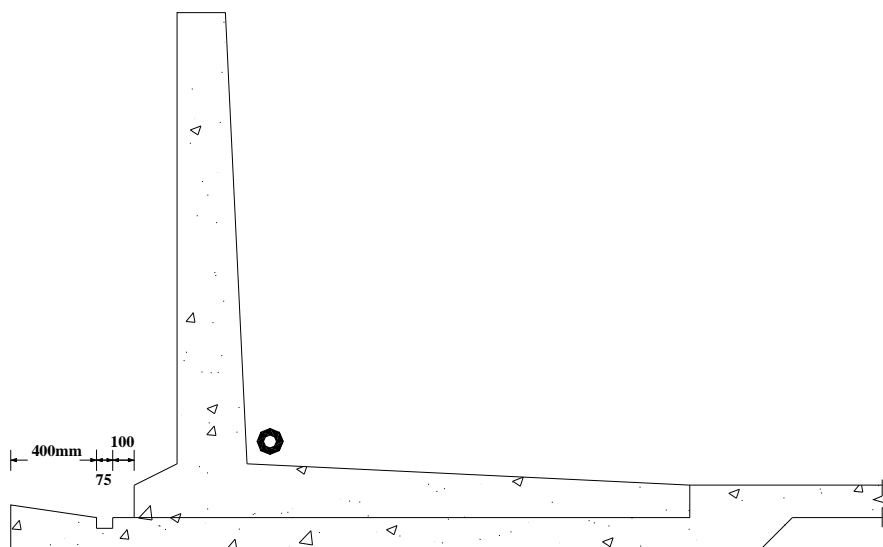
Effluent drainage arrangement for walled silo where precast concrete retainers are used
